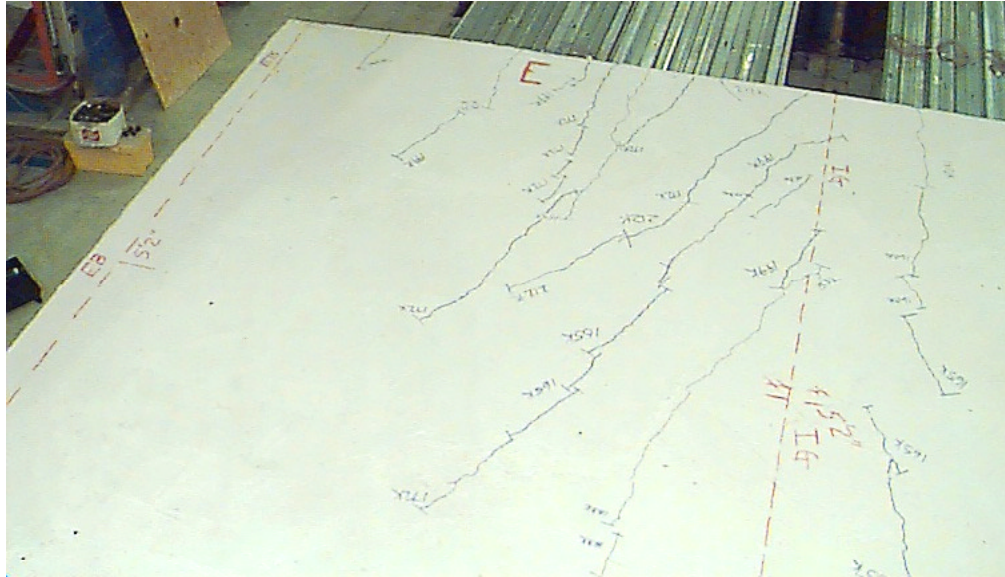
West End Slab Cracking Over EG (FF-2)
